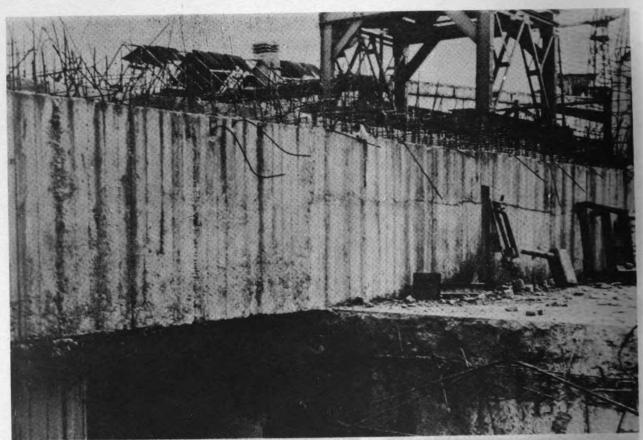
Close-up of 8 ft. thick reinforced concrete slabs beneath damaged Bldg. R
